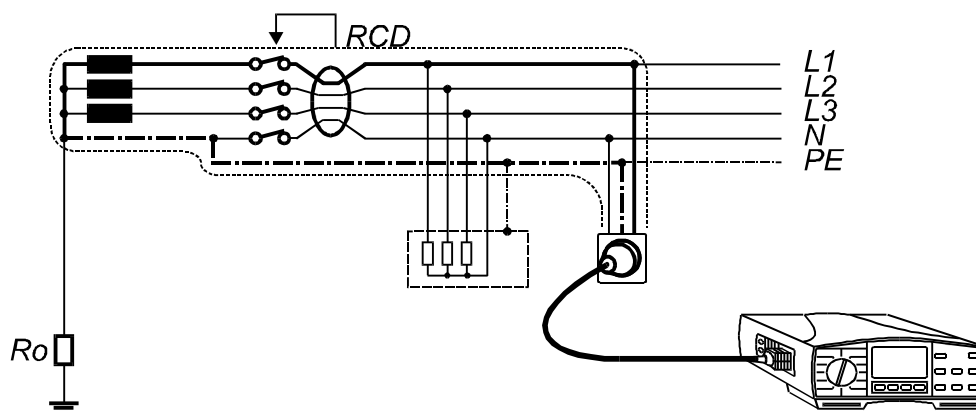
Practical connection of test instrument Eurotest 61557 or Instaltest 61557
